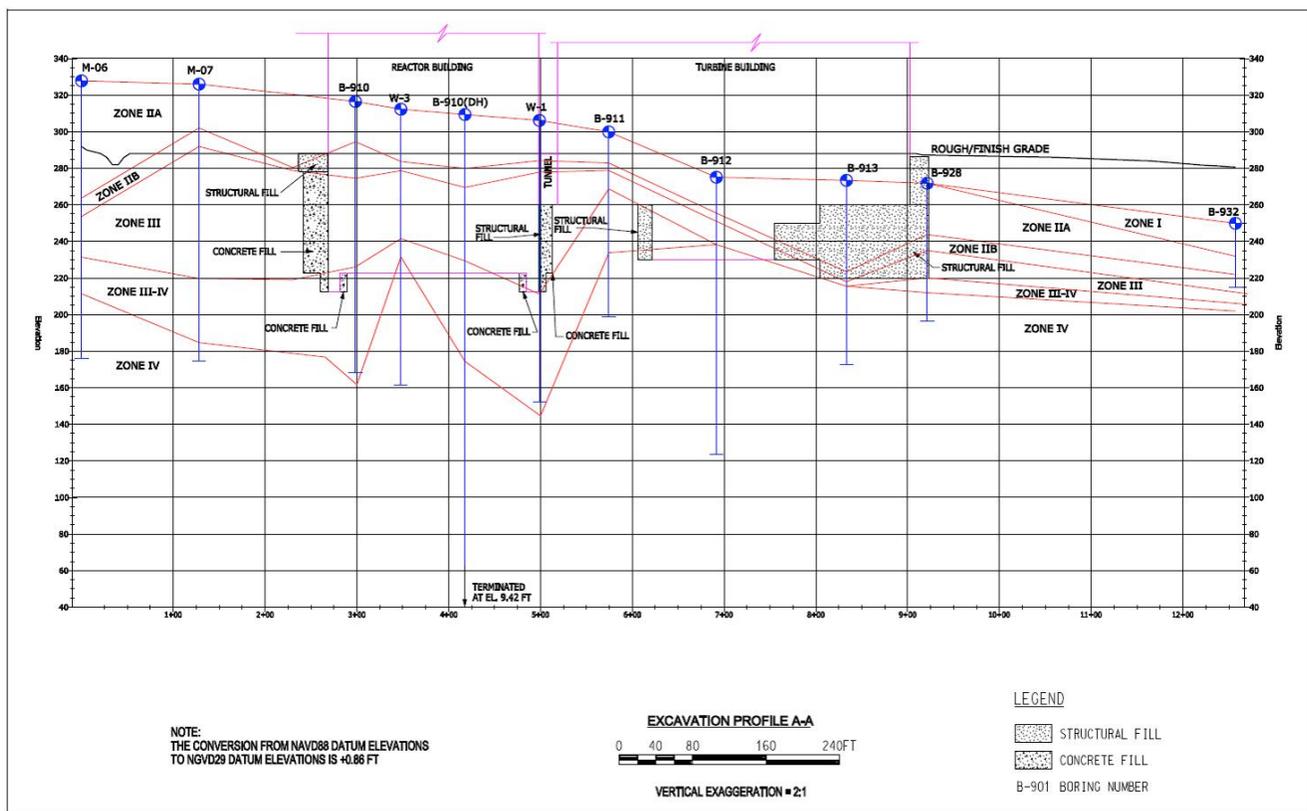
Excavation and Backfill Plan for Cross Section A-A' (FSAR Figure 2.5.4-225)
